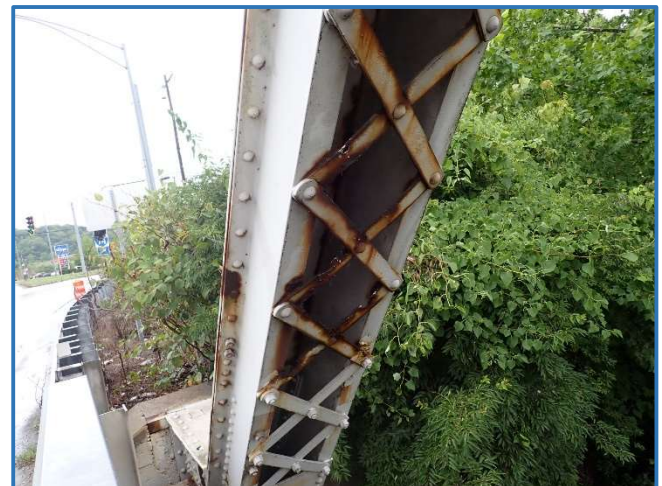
Typical lacing bars with up to 100% section loss. Shown is the end post in Span 1, North Truss, between Panel Points 0 and 1, looking northwest
